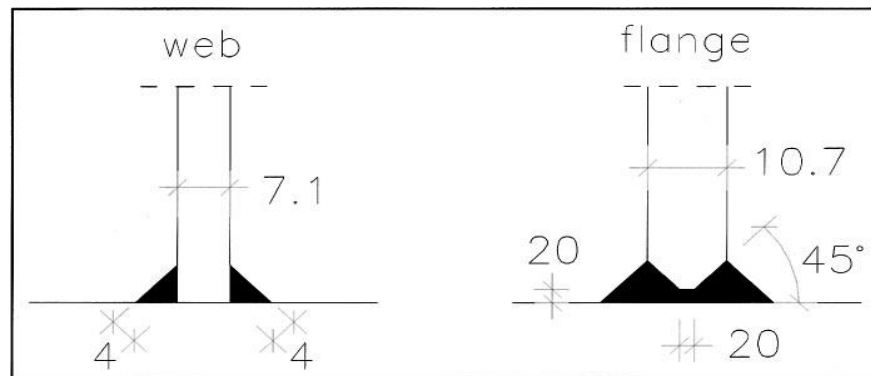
Welded beam-to-column connection with dimensions in millimetres
